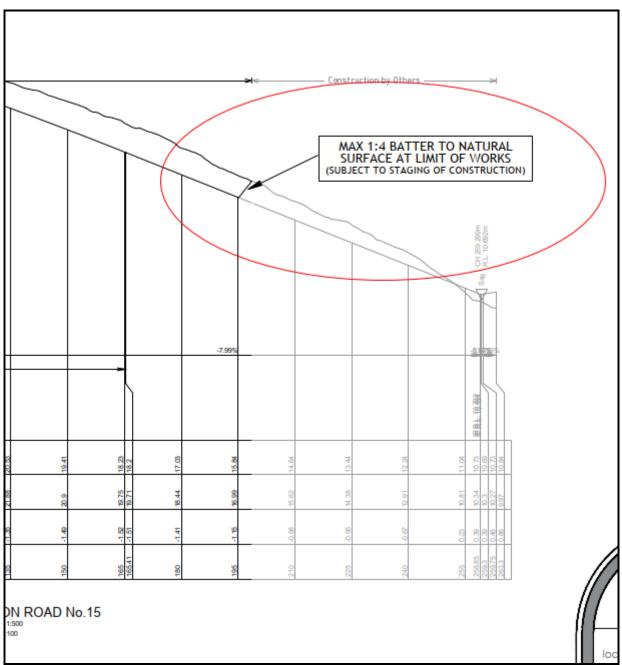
C – Road 15 long section – in conflict with Condition 47 at limit of works.
